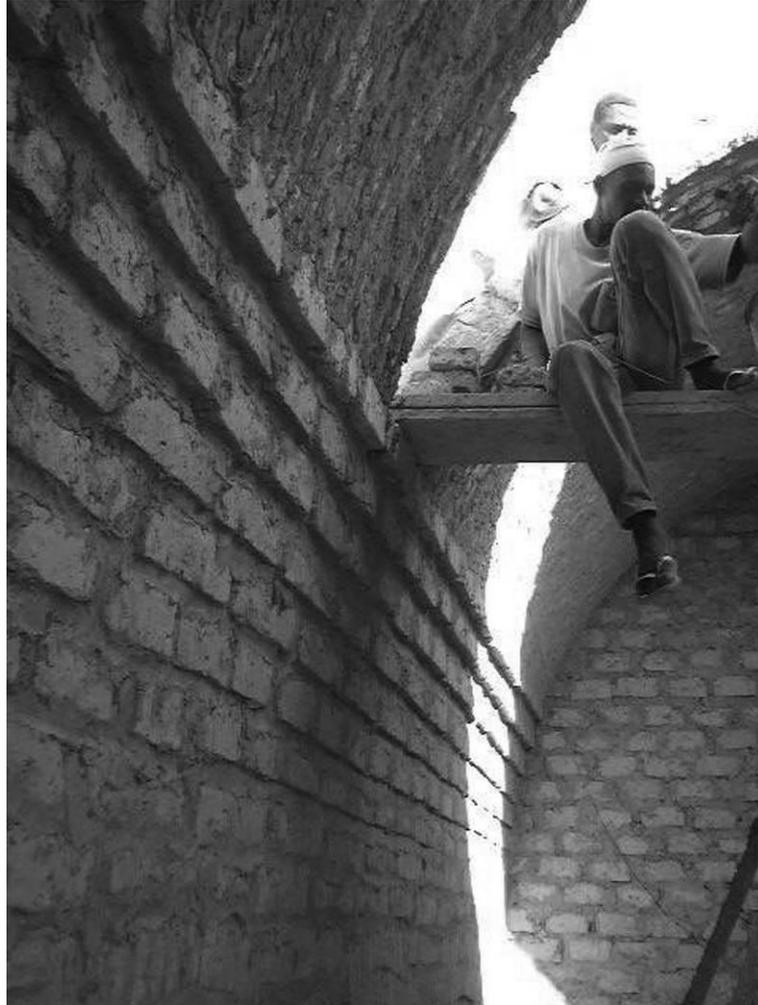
Vault building on corbelled supporting side walls gains time and structural safety.
